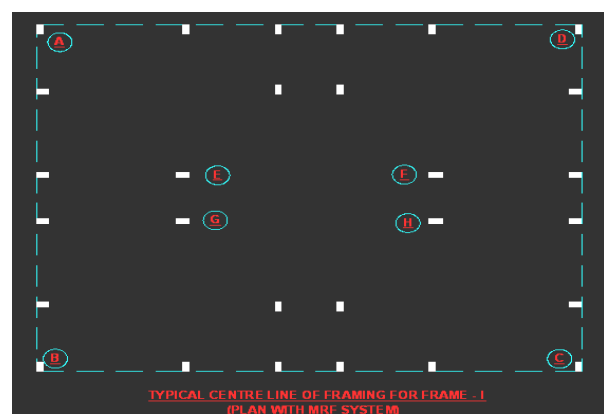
Fig. III Typical Framing for FRAME-I (Plan of Moment Resisting Frame)
